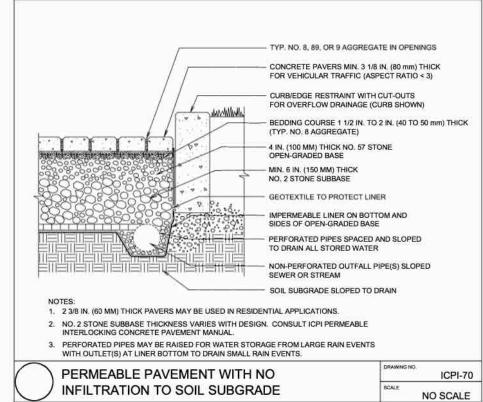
PERMEABLE PAVEMENT WITH NO INFILTRATION TO SOIL SUBGRADE
